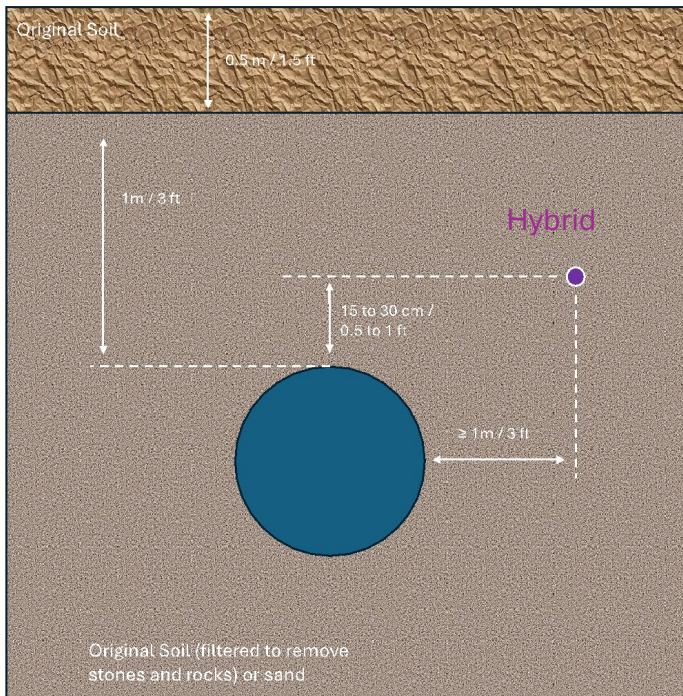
TRENCH CROSS SECTION WITH PIPE AND POSITION OF HYBRID SENSING CABLE.
